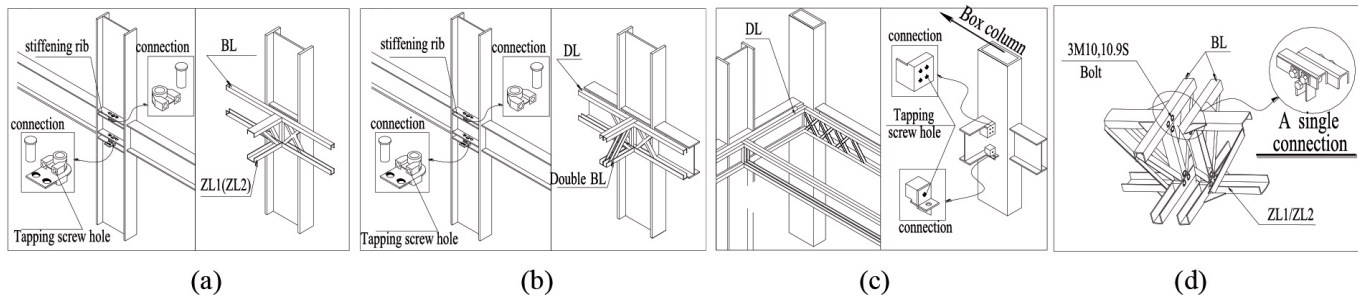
Slab-column connection and slab-slab connection for type-I specimens. (a) Slab-middle column connection (Mode A). (b) Slab-middle column connection (Mode B). (c) Slab-corner column connection (Mode C). (d) Slab-slab connection
